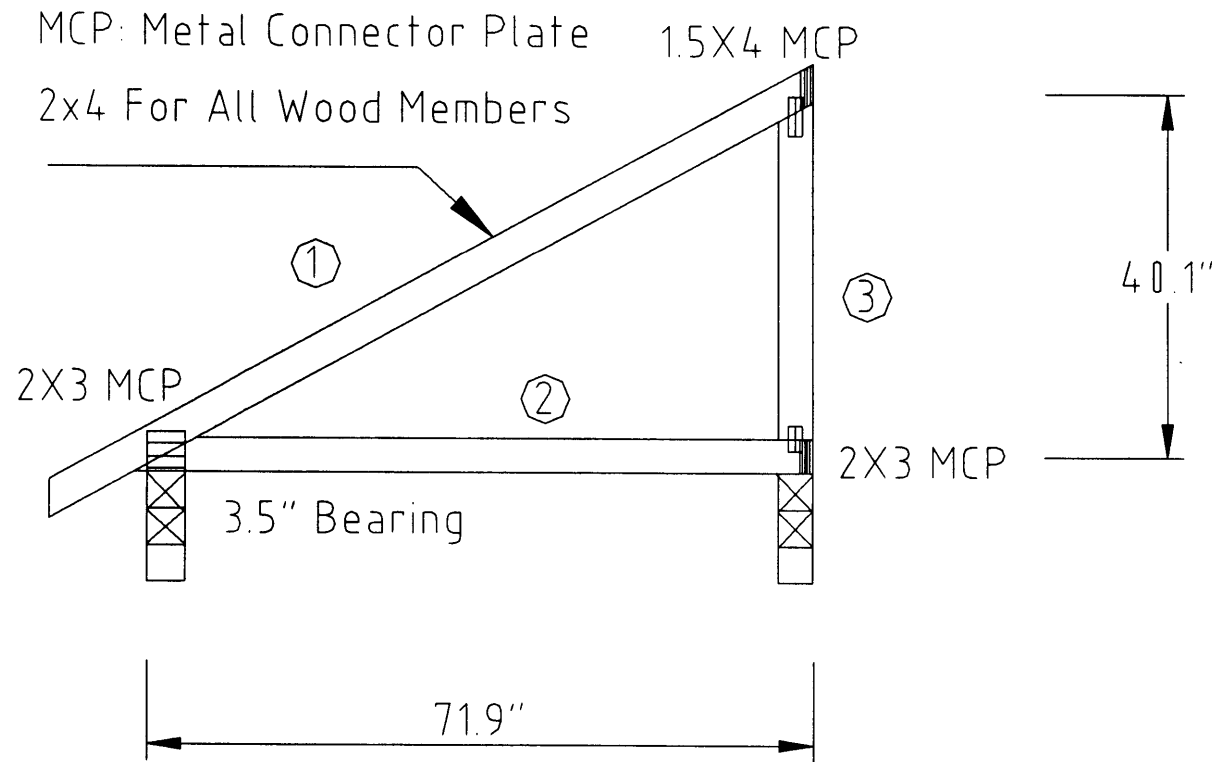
MPC Truss Type J1 from a Truss Plate Manufacturer
